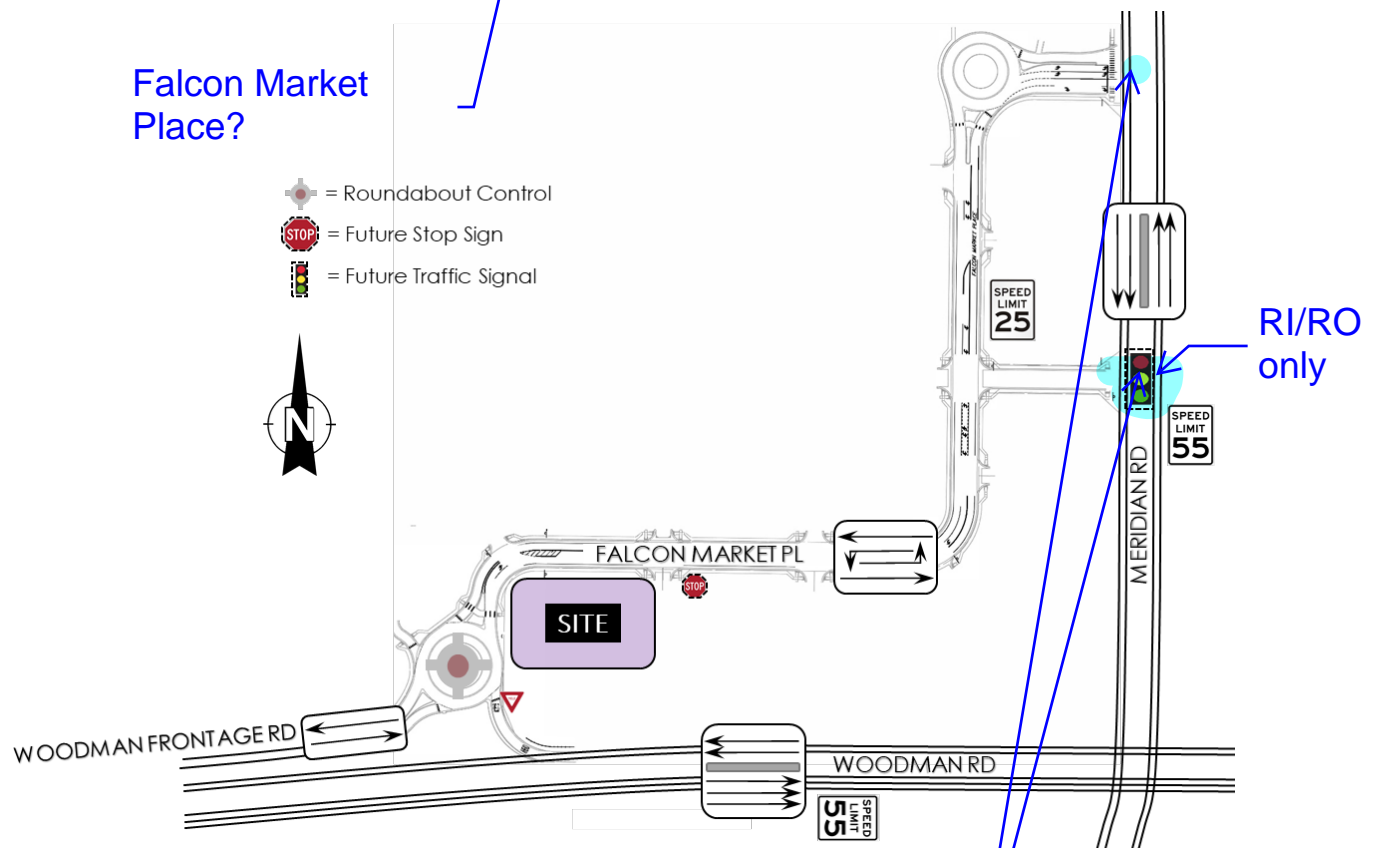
Existing Roadway Network and Intersection Lane Configuration
